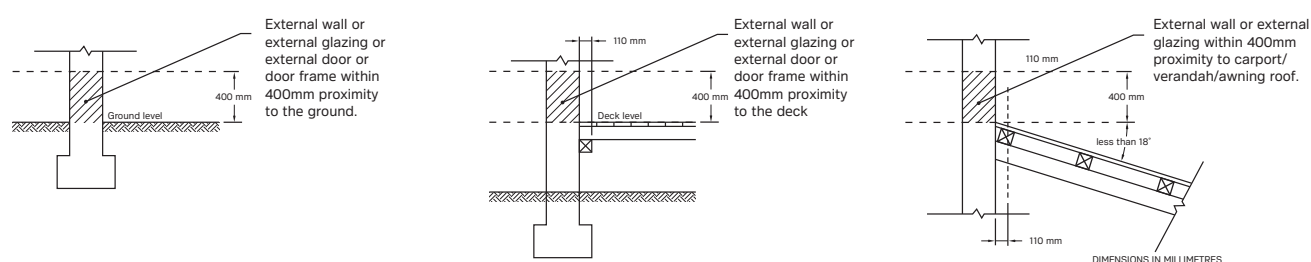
EXTERNAL WALLS OR EXTERNAL GLAZING, OR EXTERNAL DOORFRAMES WITHIN LIMITS ABOVE GROUND, DECKS, CARPORT ROOFS
